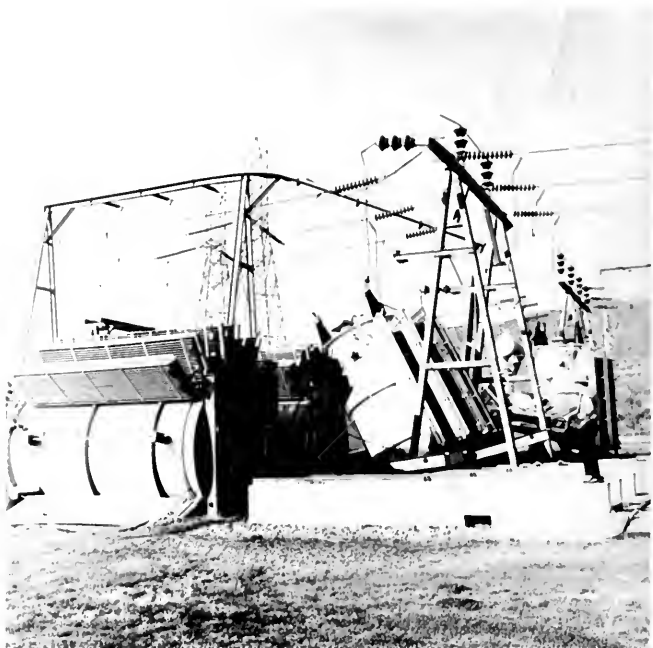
Damaged pole-mounted transformer on ground. Los Angeles Department of Water and Power photo.
